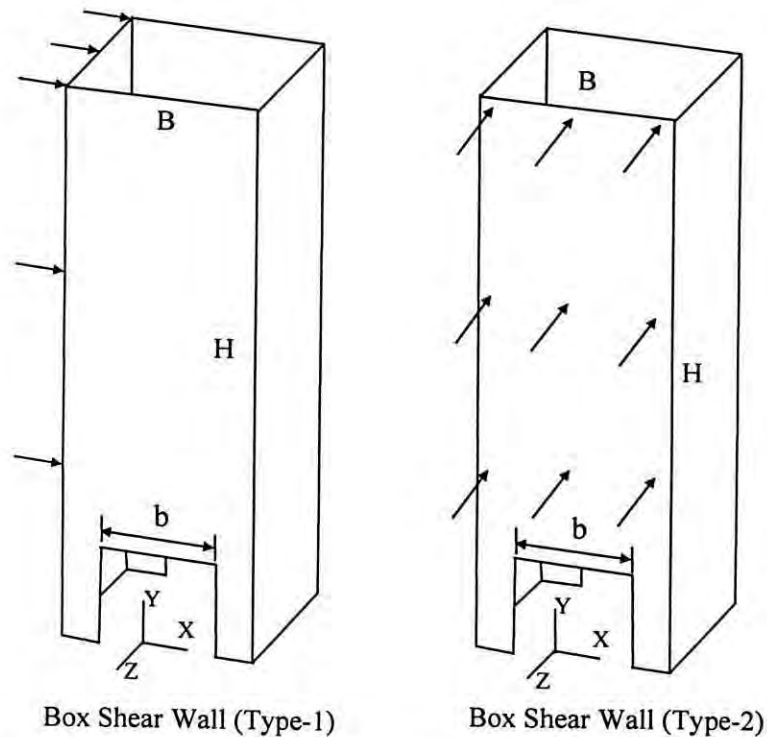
Two Distinct Loading Types (Depending on the Loading Direction) of Box Shear Wall with Base Opening Considered.
